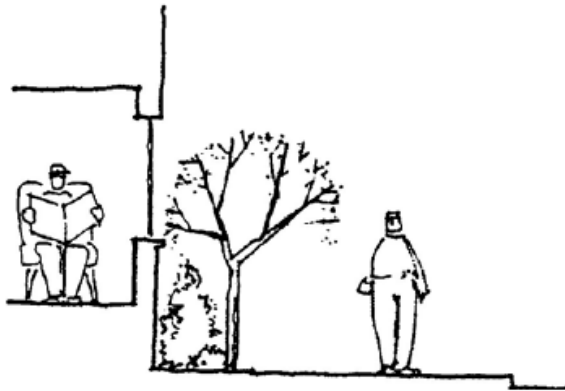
Where a setback from the sidewalk is small, raising the floor level up more than 4' above the sidewalks and/or providing a planting bed can provide a sufficient transition.
